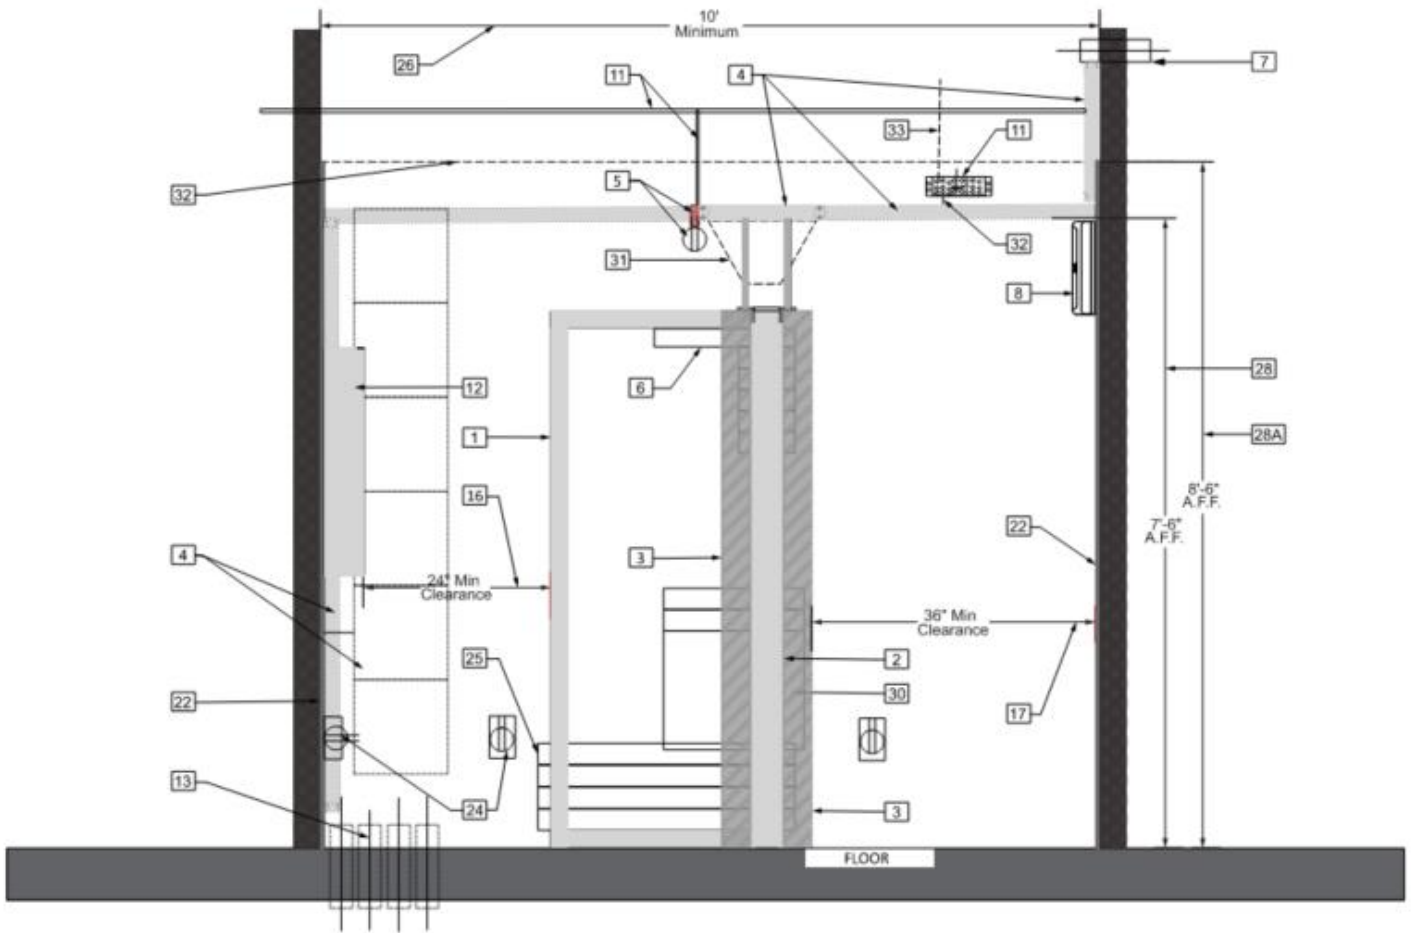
05 00-3c Typical MDF/IDF Side Elevation
